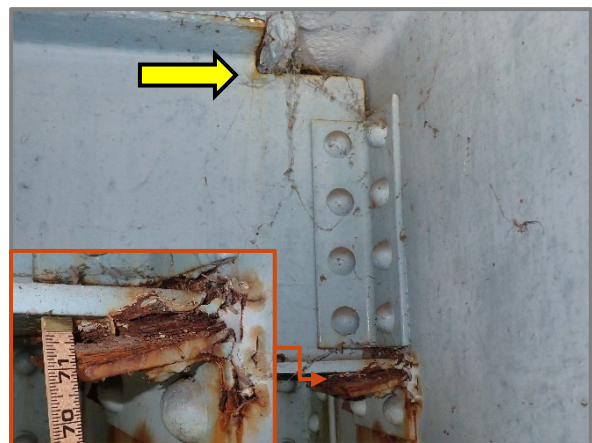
Up to 1" thick pack rust between Stringer 1 bottom flange and seat angle at the connection to Floorbeam 9 in Span 2, looking north. Note cleaned and painted pitting up to 1/8" at stringer web cope and failing paint with minor surface corrosion on the stringer top flange.
